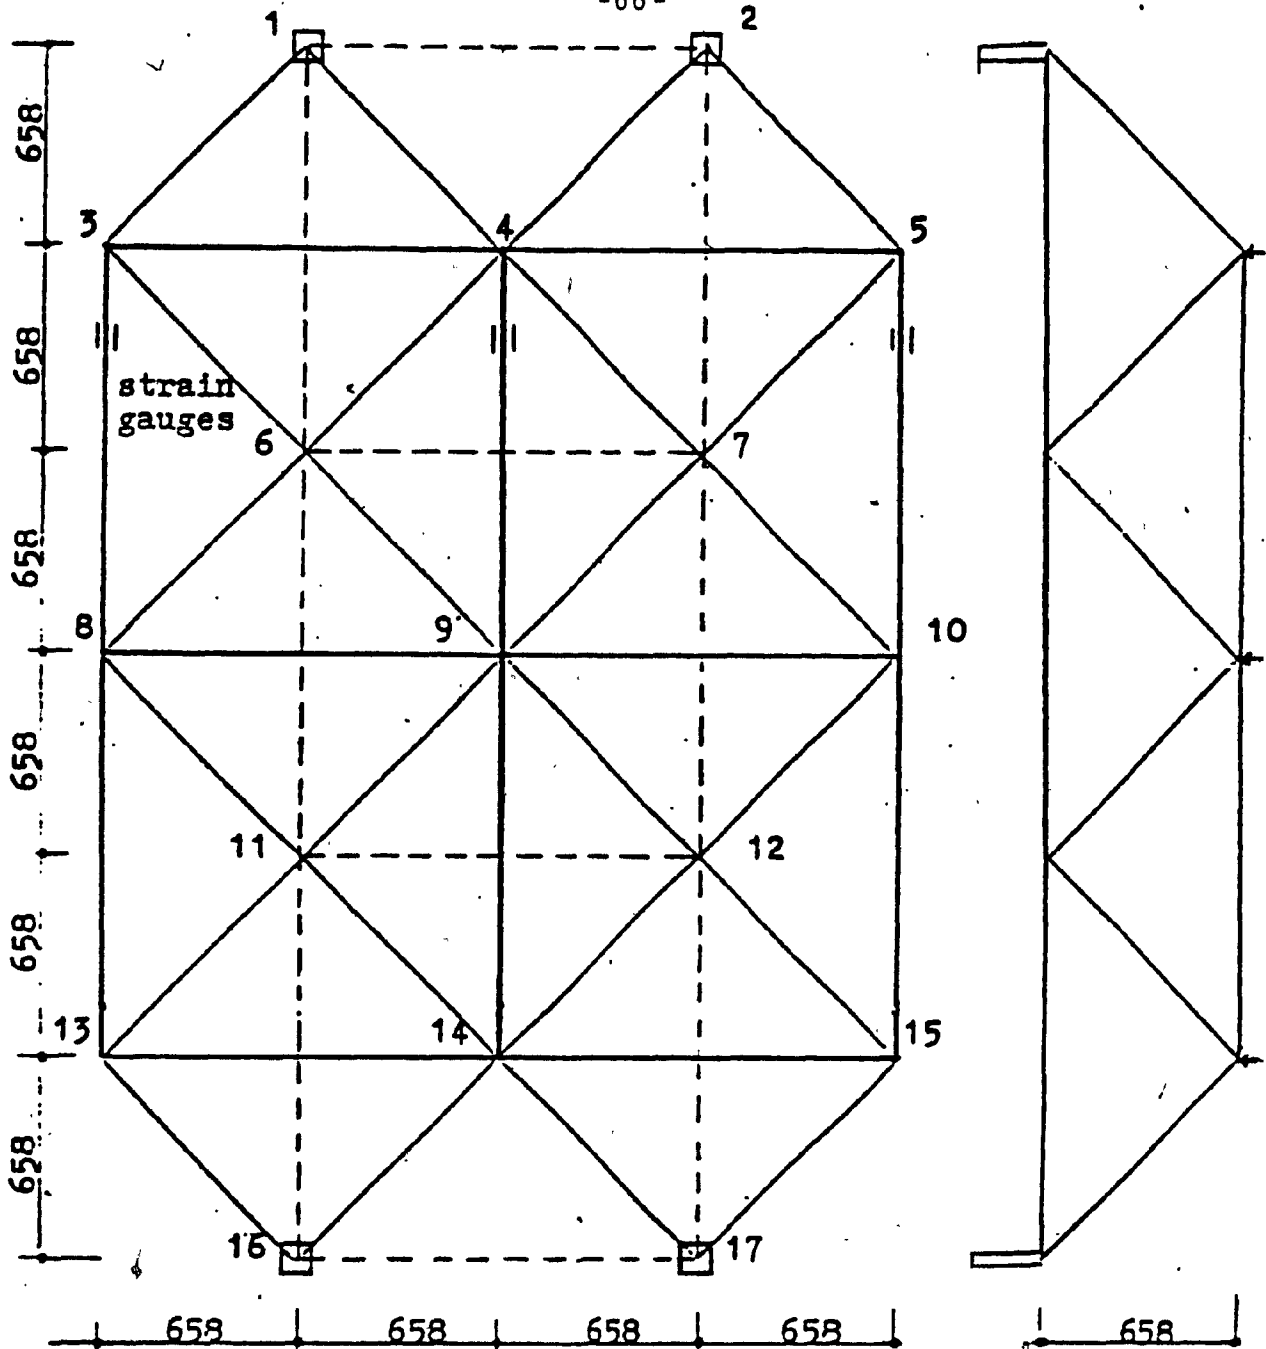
ARRANGEMENT OF MEMBERS OF THE TEST TRUSS
